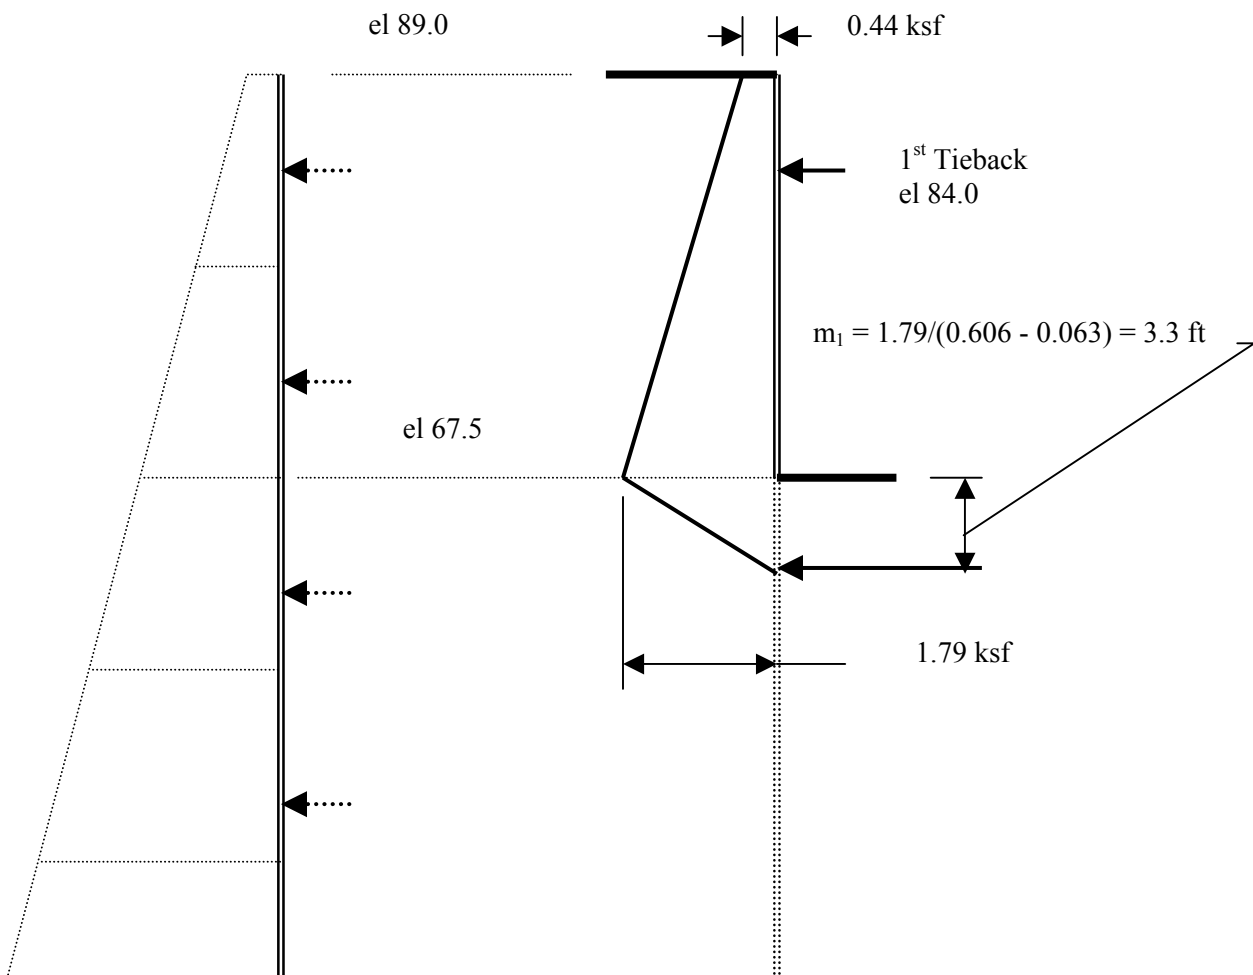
Step 6, excavate to el 67.5, second-stage excavation
